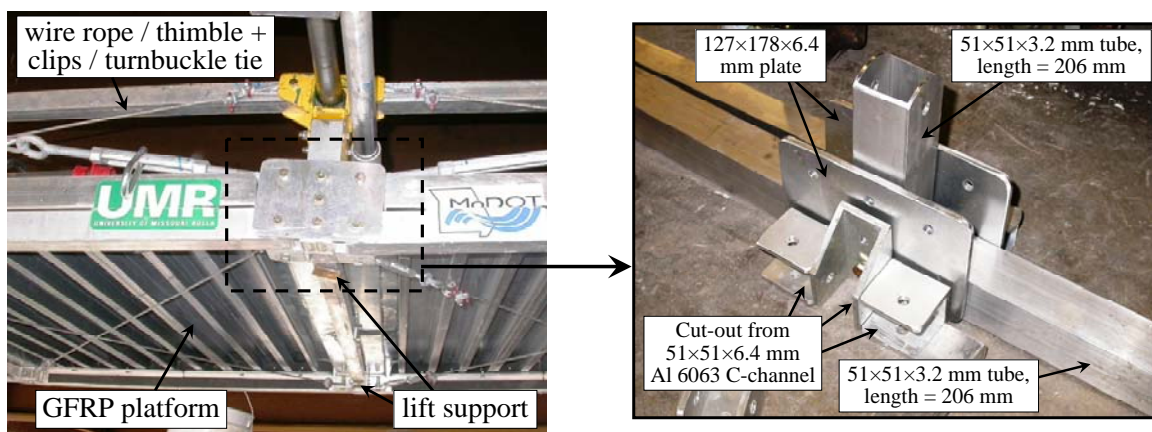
Detail of bolted connection assembly (material Al 6061-T6 unless specified).
